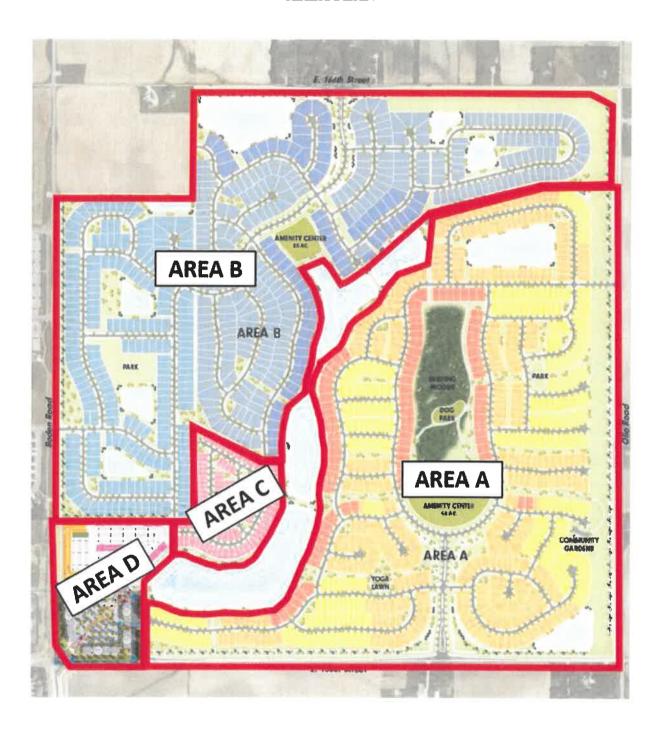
AREA D – CONCEPTUAL SITE PLAN
